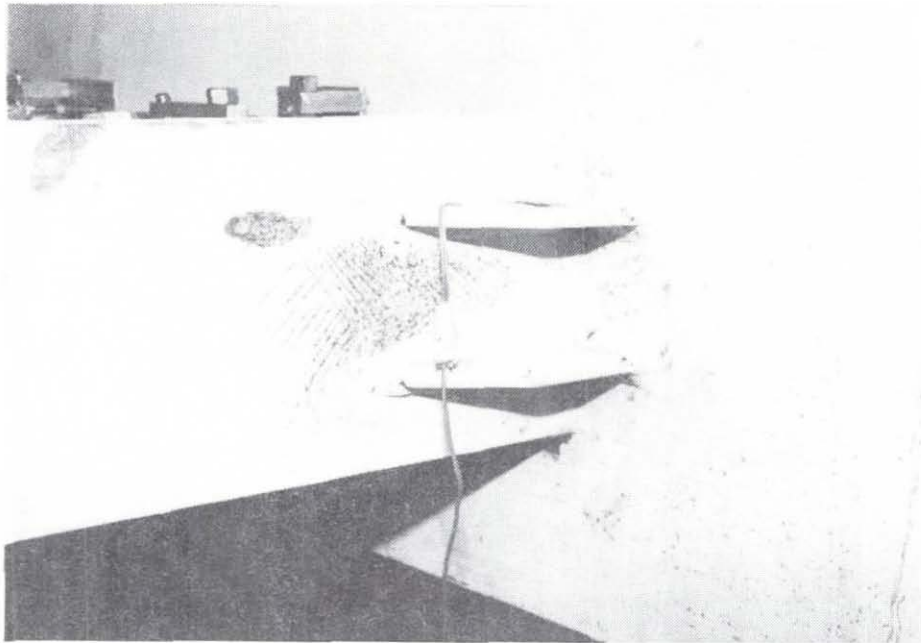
Flaking of Whitewash at Top Flange (Specimen 7)
